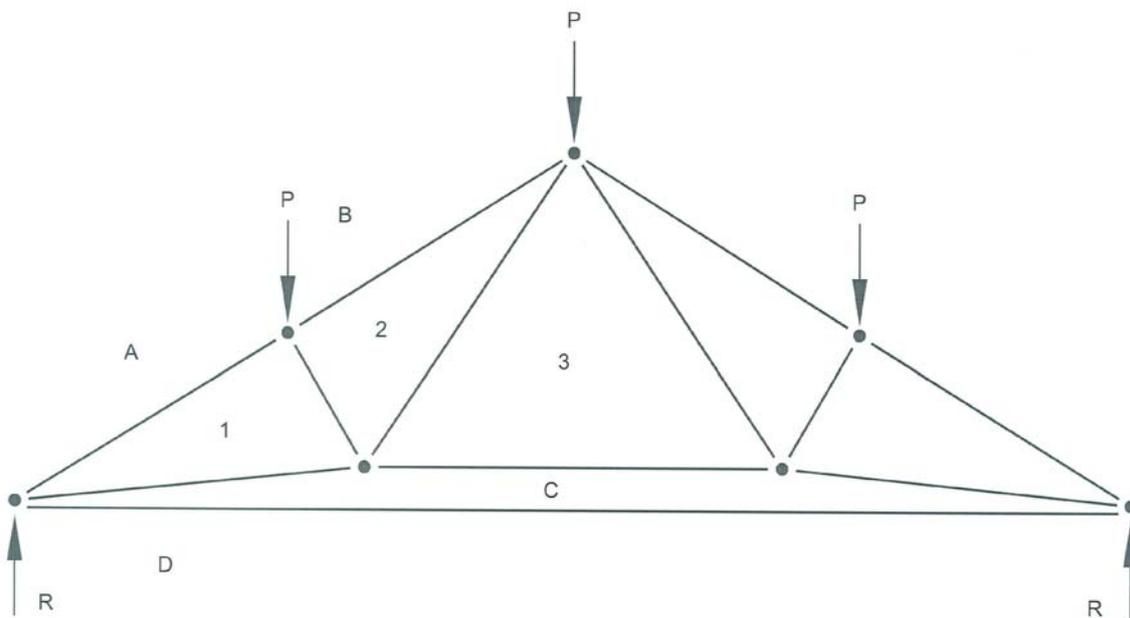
This shows the placement of the unit loads for the load test with the loads located at joints.
